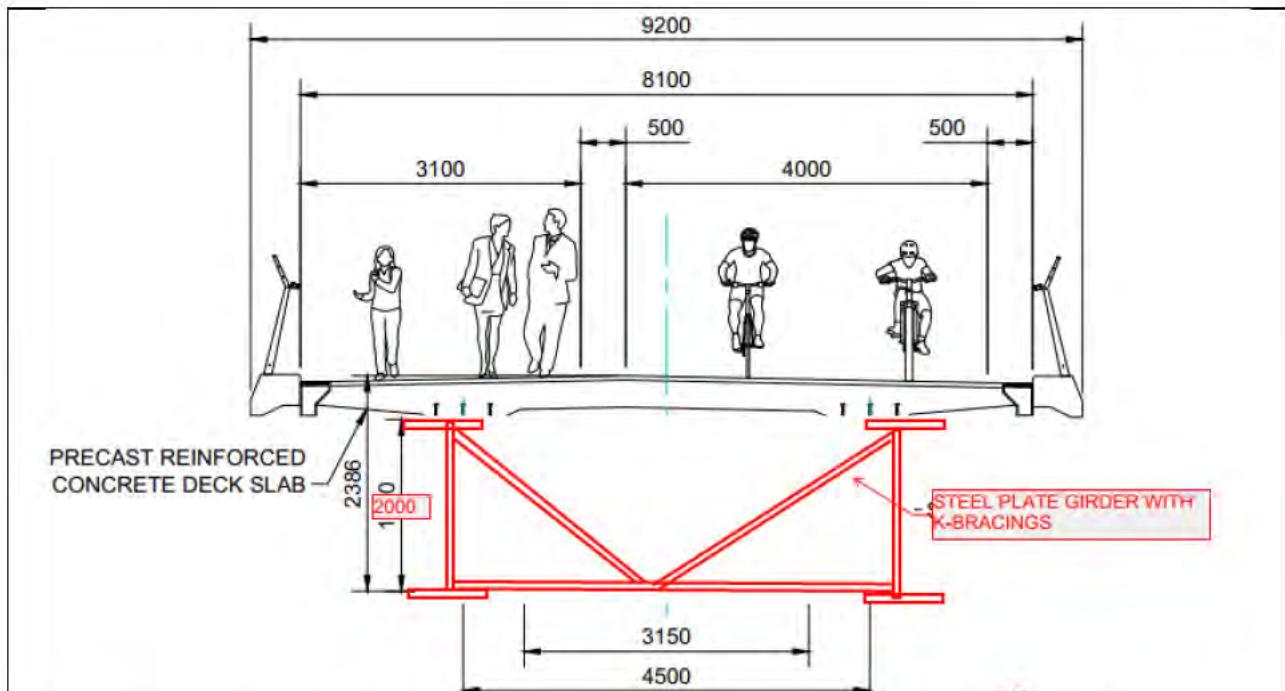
Steel Plate Girder (with K-bracings & concrete deck) – alternate option to box girder
